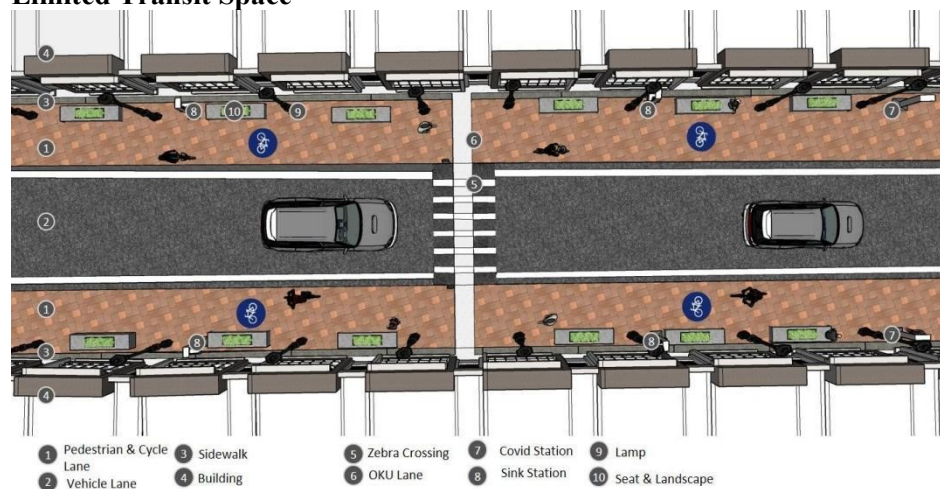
Proposed pedestrian walkway (Limited Transit Space)
